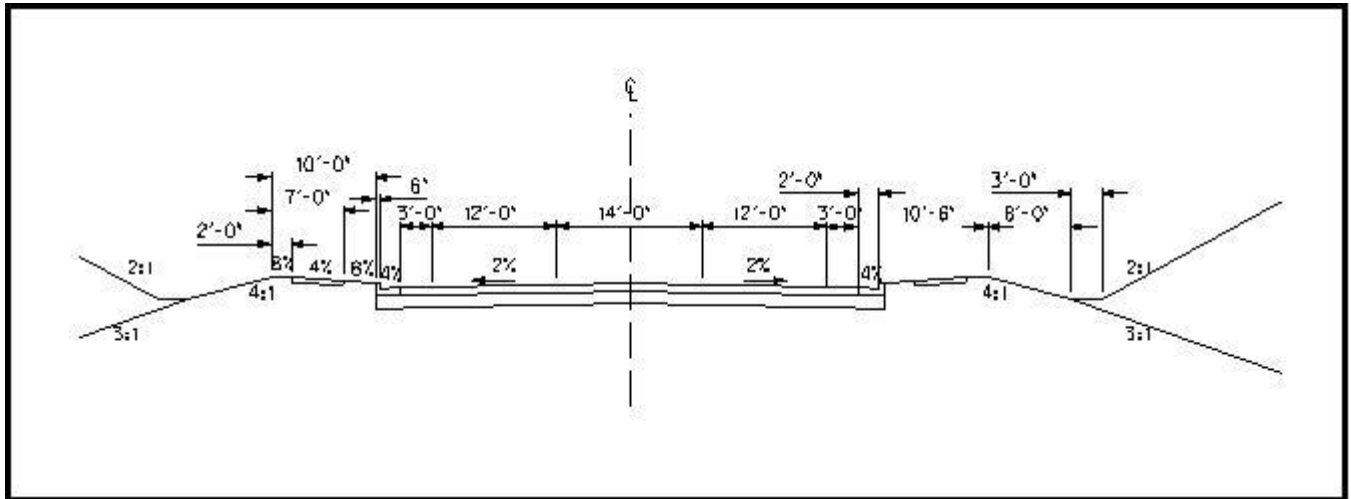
Typical Section: Three-lane Curb and Gutter
